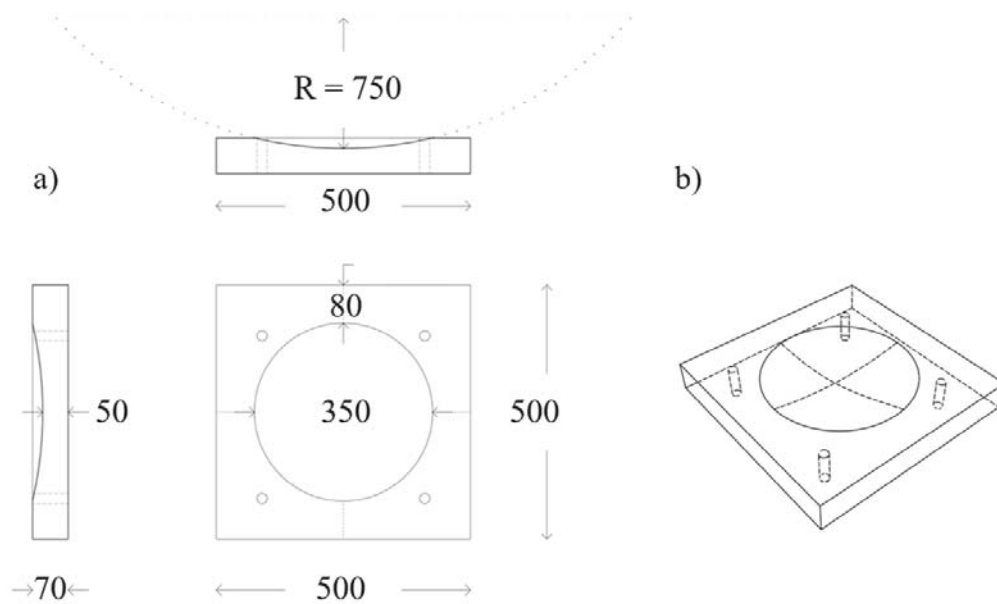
Schematic representation of the utilized concave concrete plates (dimensions in mm); a) Plan and side views, b) 3D view
